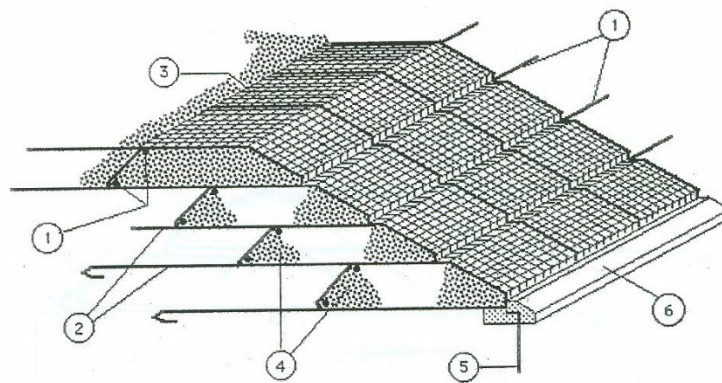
Fika Patso Dam Reinforced Breakwater Protection System (ICOLD, 1993)
